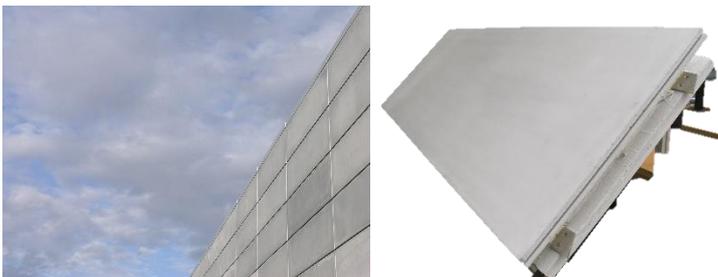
Façade made of textile reinforced concrete (left); façade panel (right)
